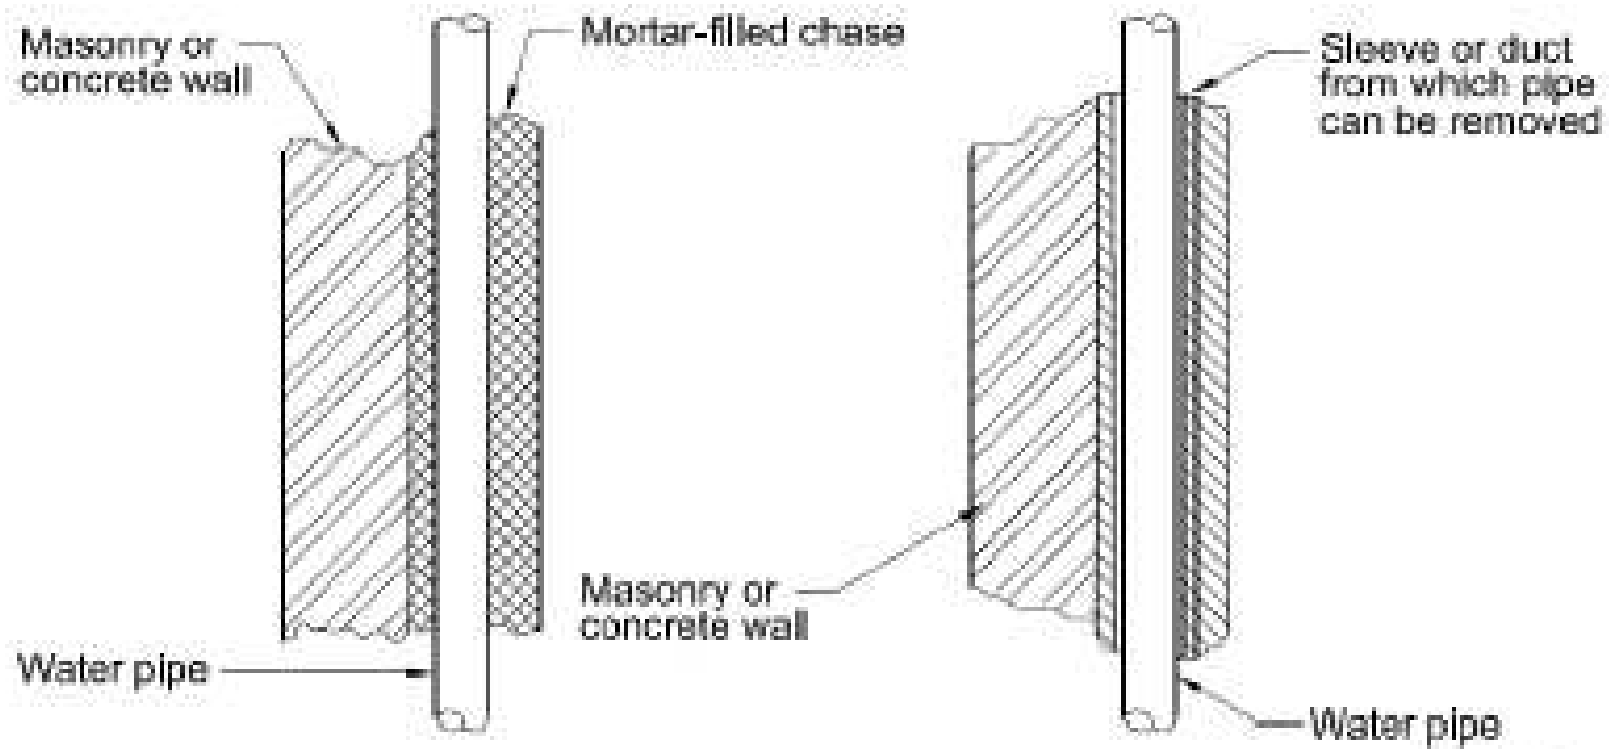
Sleeve for installing a water pipe under a building or under a surface slab
